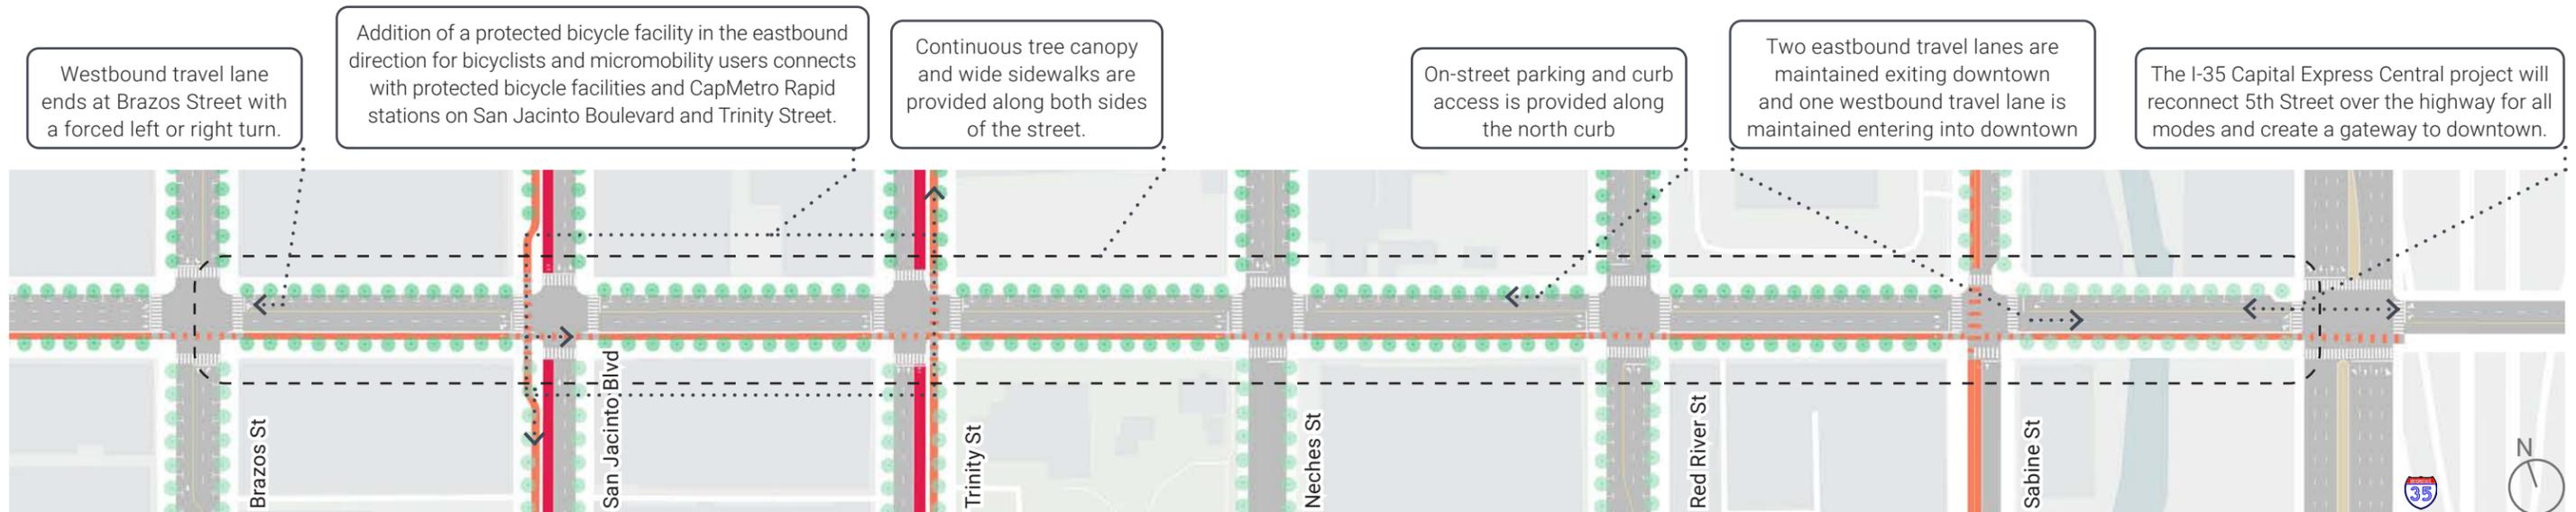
Fifth Street schematic Brazos Street to I-35
